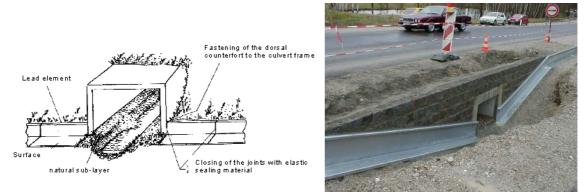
Amphibian Crossing Culvert and Guiding Guardrail, designing detail and construction solution [8]
